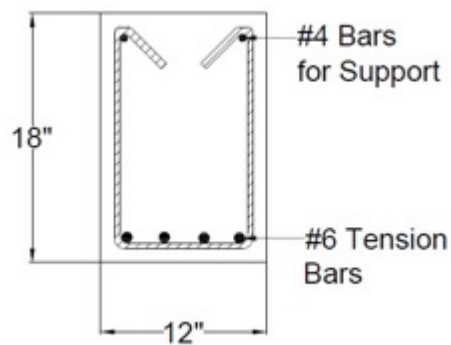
Full-Scale Control Beam Specimen Cross-Section
